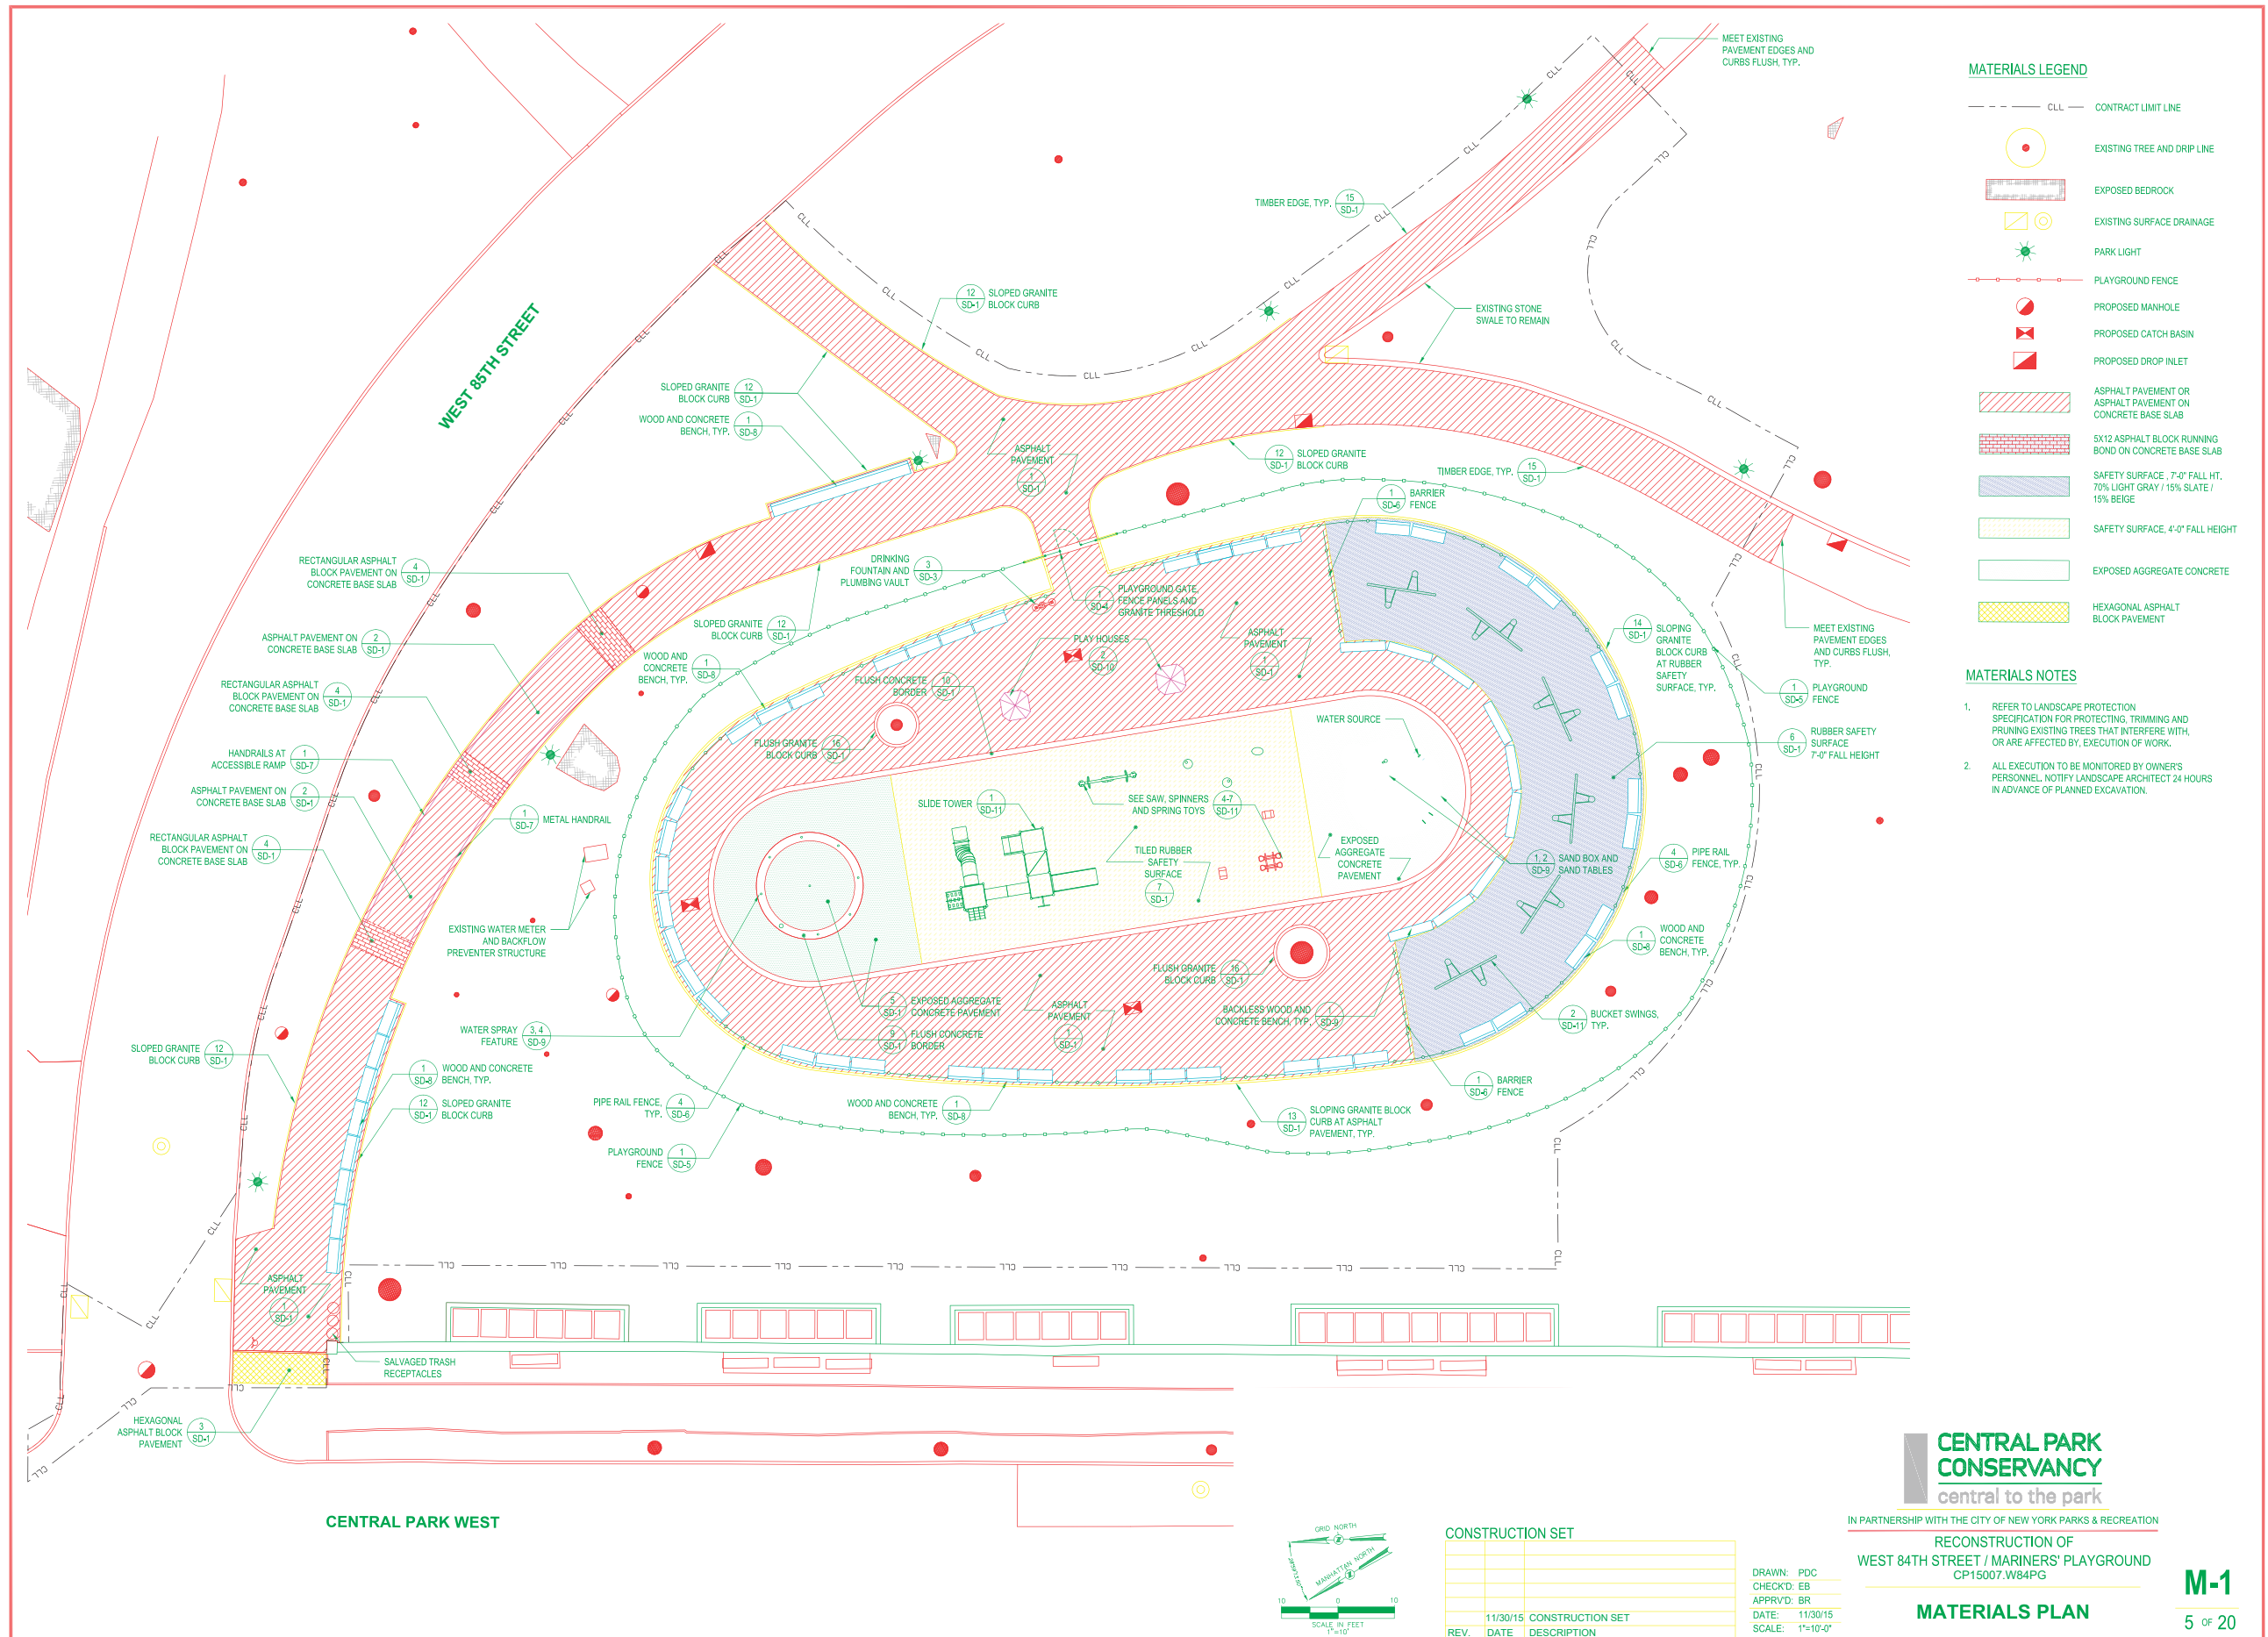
Plan Showing Proposed Improvements at Mariners' Playground, Central Park.
